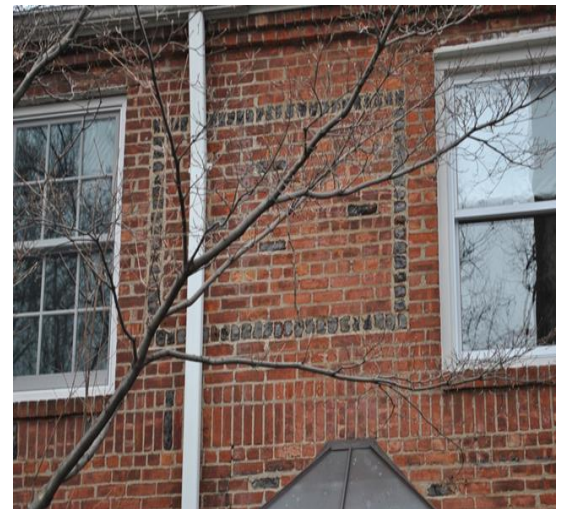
Image and Detail 5-4: Decorative Clinker Brick Ornamentation on Facade, 39-79 to 39-81 49th Street, Harrison Place, Queens, NY
